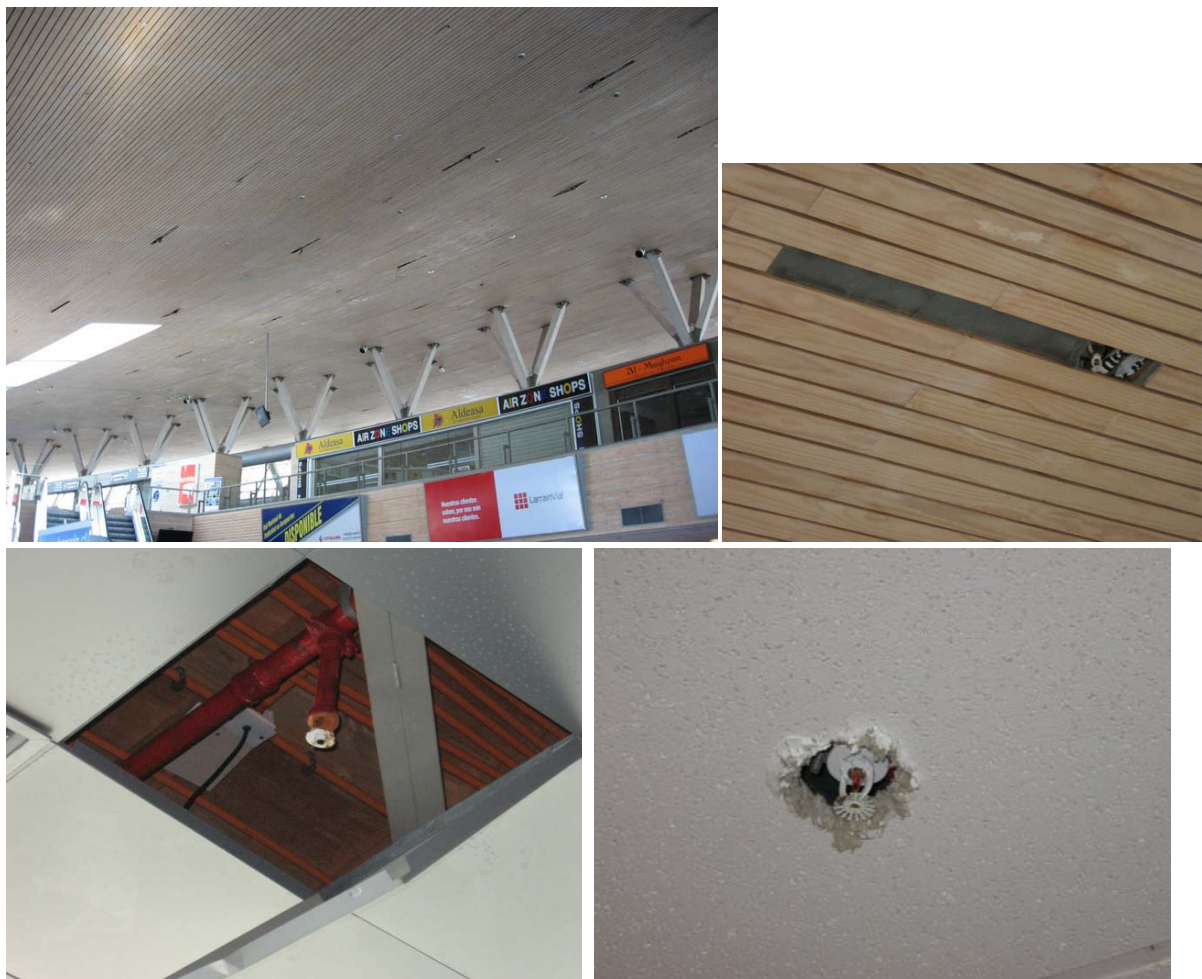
Conflicts between the sprinkler heads and several types of ceiling finishes resulted in damage to the ceilings, sprinkler heads and subsequent water damage at the Concepción airport in the 2010 magnitude-8.8 Chile Earthquake (Photos courtesy of Rodrigo Retamales, Rubén Boroschek & Associates).
